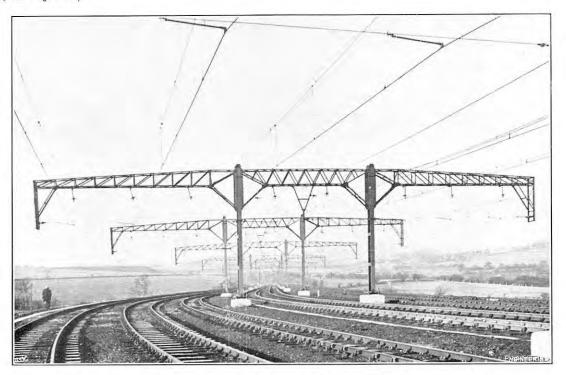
CANTILEVER STRUCTURES AT WOMBWELL.
